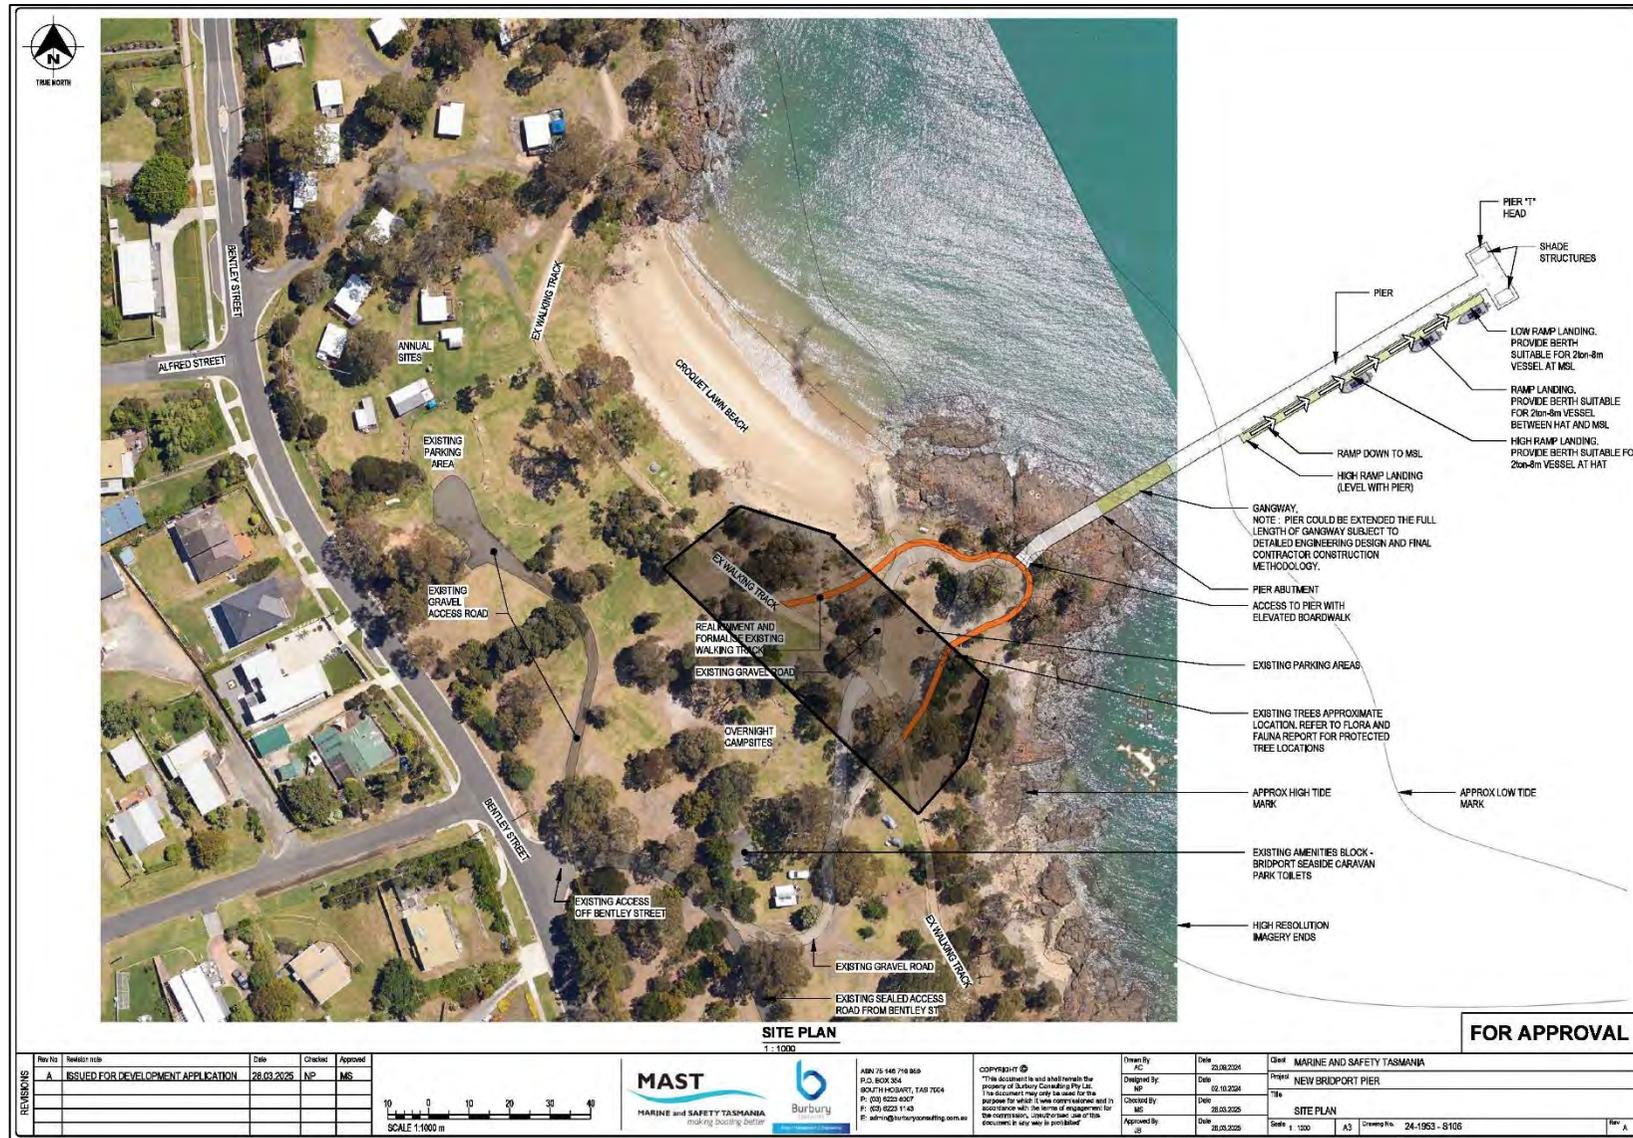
MAST site plan of the 2025 Bridport Pier Project footprint, including field survey footprint (shown in black).
